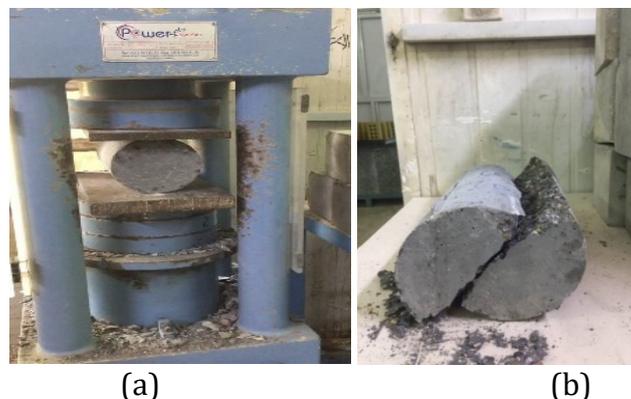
Splitting tensile strength test; (a) testing machine; (b) testing cylinder failure.
